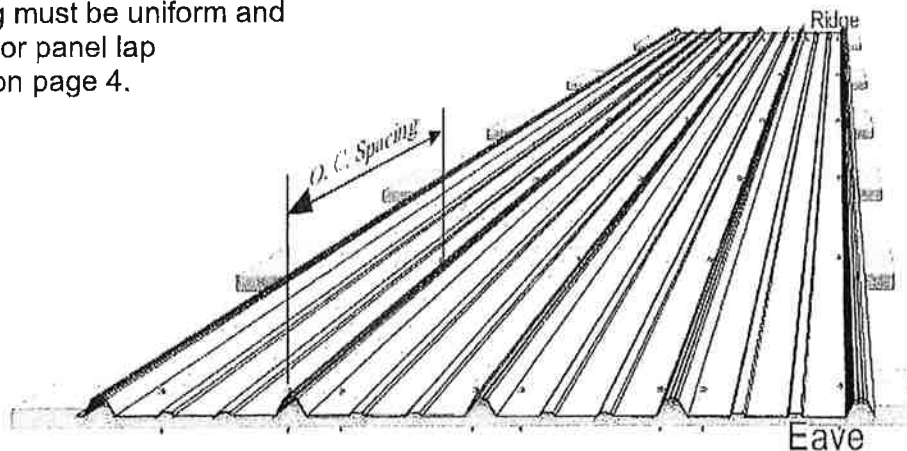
Screws should be placed on both sides of the ribs at both eave and ridge.
